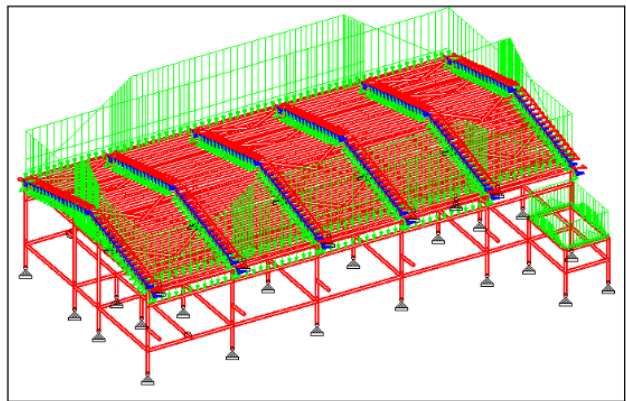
a 1.2 DL + 1.6 LL + 0.5 RL (Section 203-2) as Load Combination
